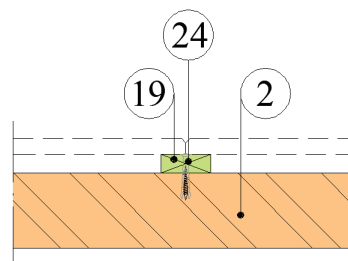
Vertical wood lathing fastening on to a load-bearing wall structure.
